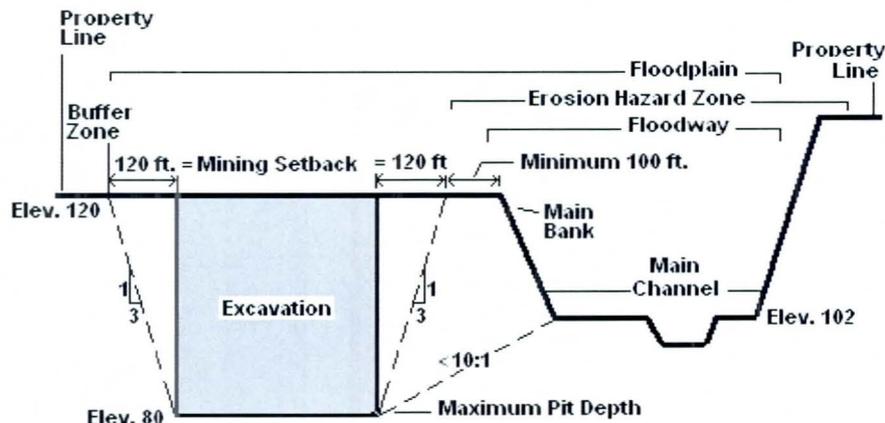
Floodplain excavation pit geometry for streamlined floodplain use permit.
